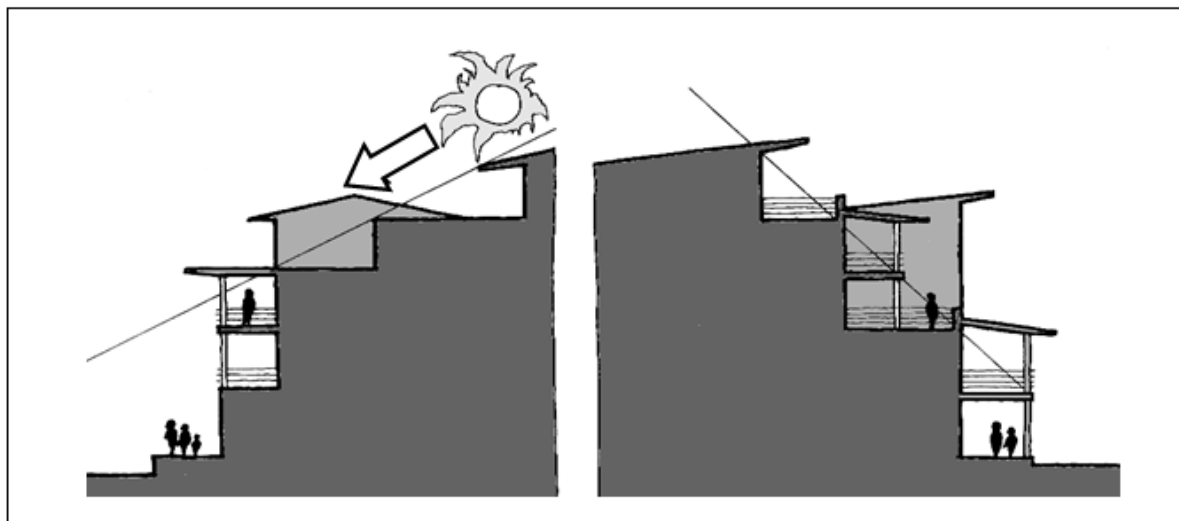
Building envelopes - Cross sections through street and laneway frontages
